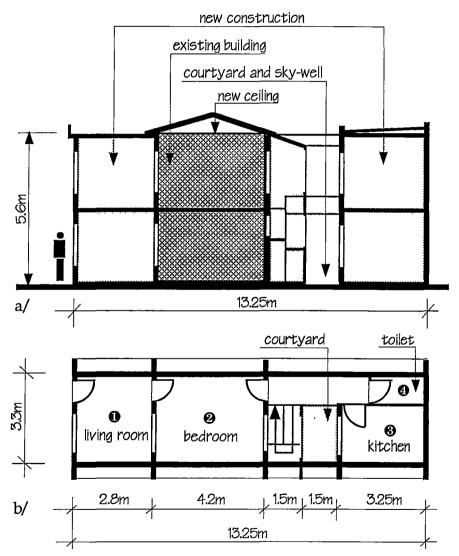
Example of upgrading housing on substantial scale. a/ Section b/ Plan of ground floor
